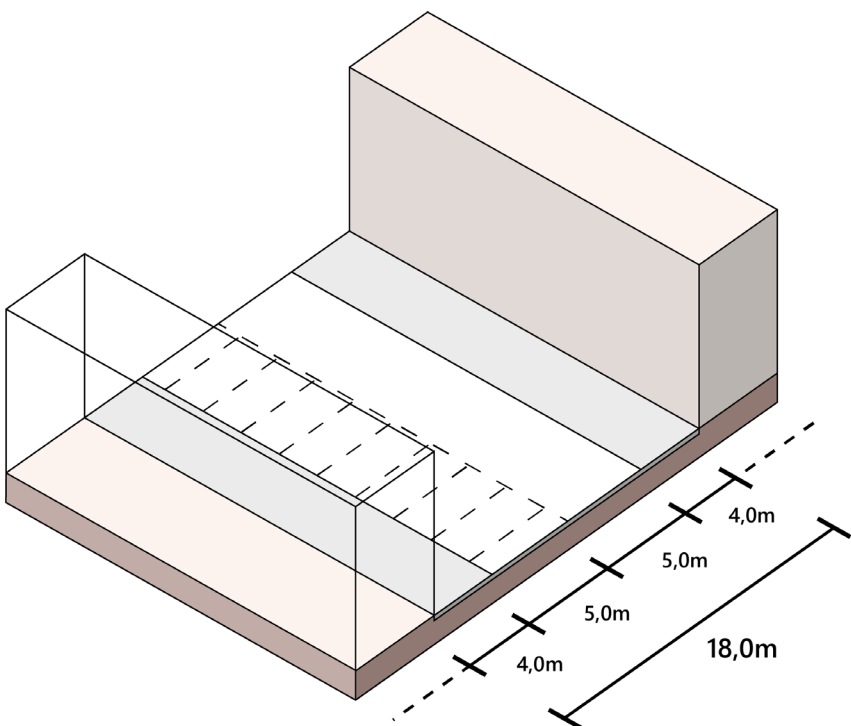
Axonometric street segment and potential interventions of type 7. Made by Author.
